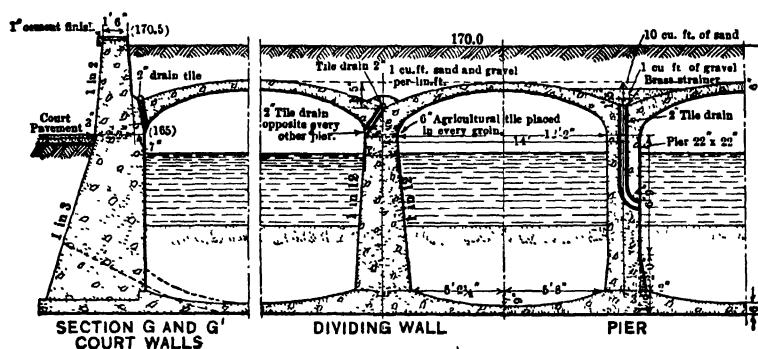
Cross-section of Slow Sand Filter, Washington, D C
